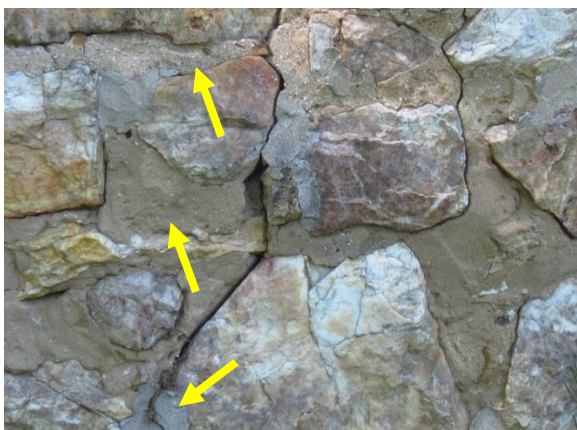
Typical multiple vintages of mortar on west and east foundation walls.
